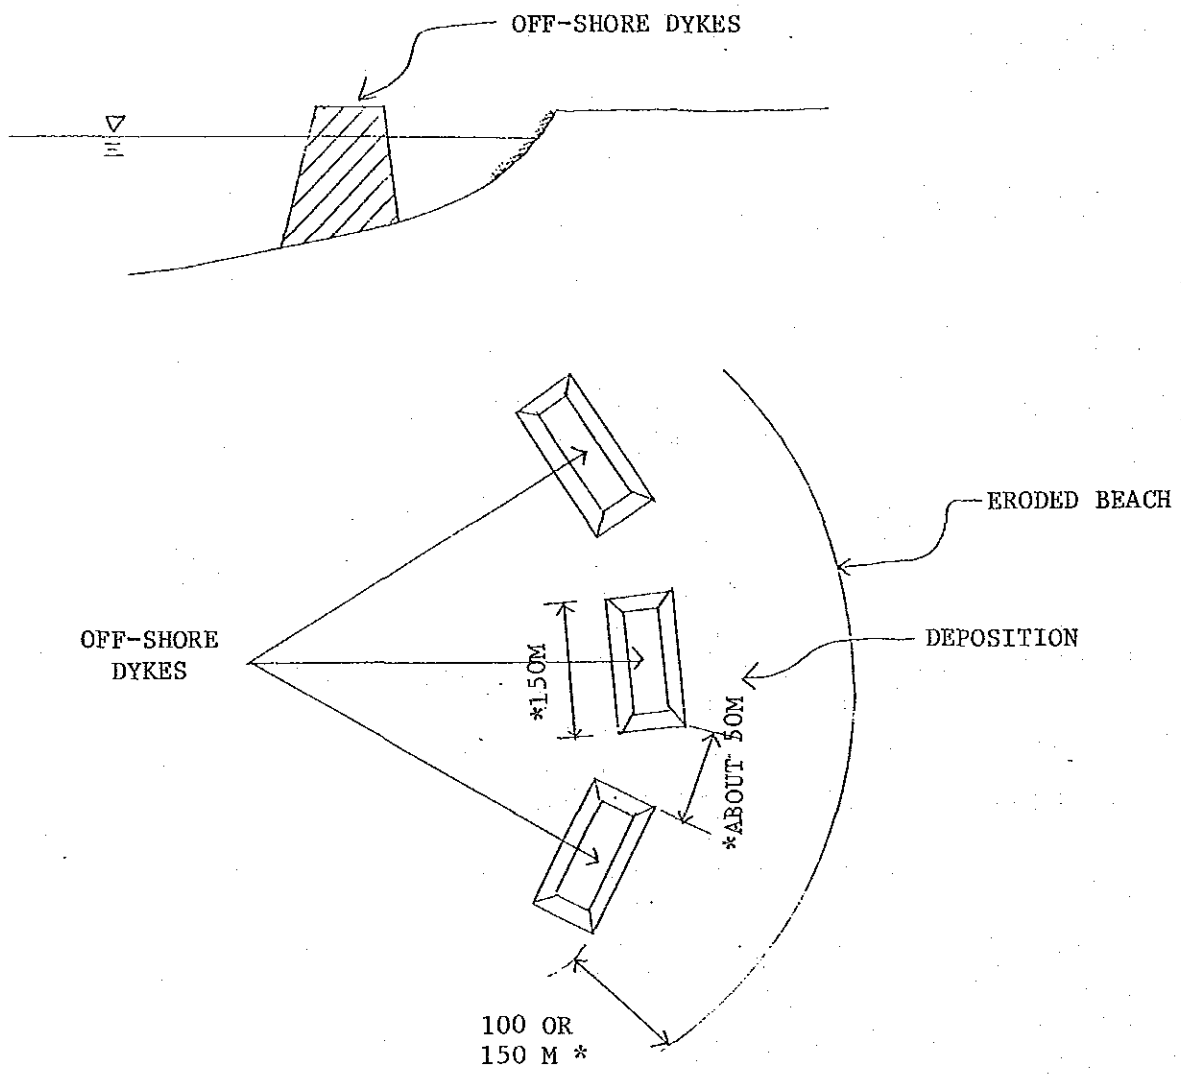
CONCEPTUAL PLAN, DUNGUN RIVER
